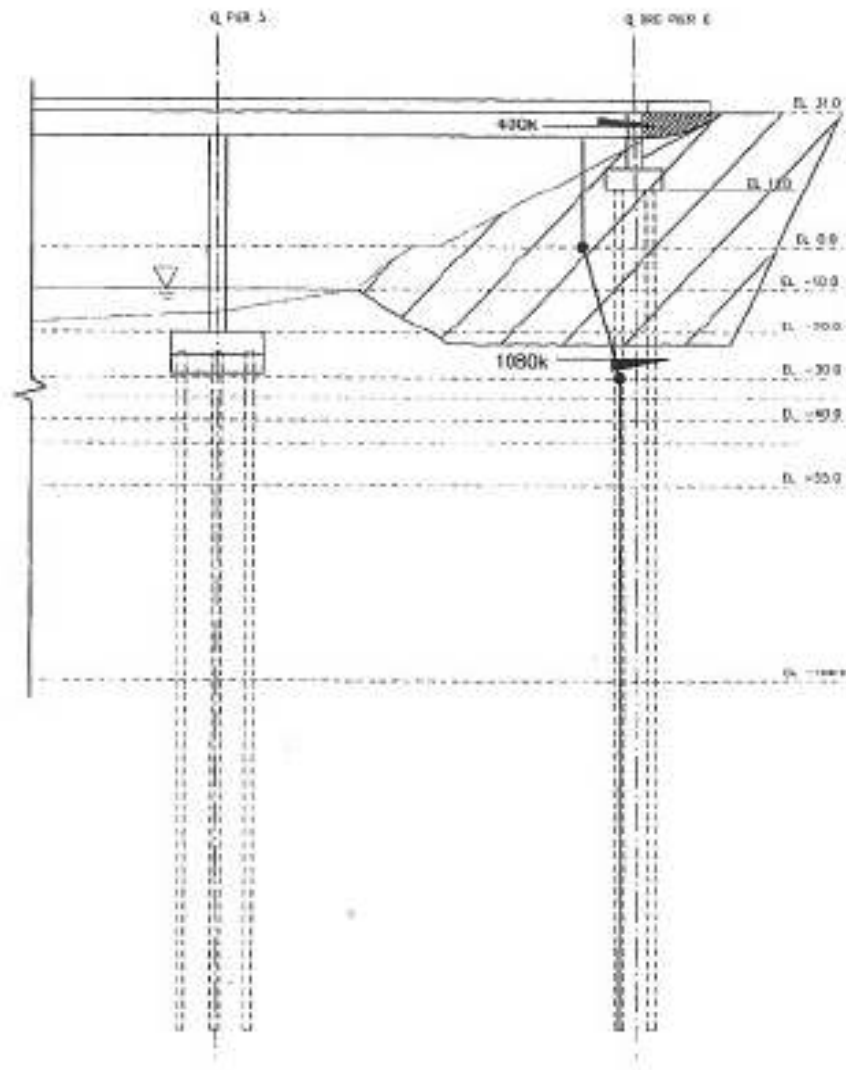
Plastic Hinge Location Along the Pile, Washington Bridge, Pier 6
